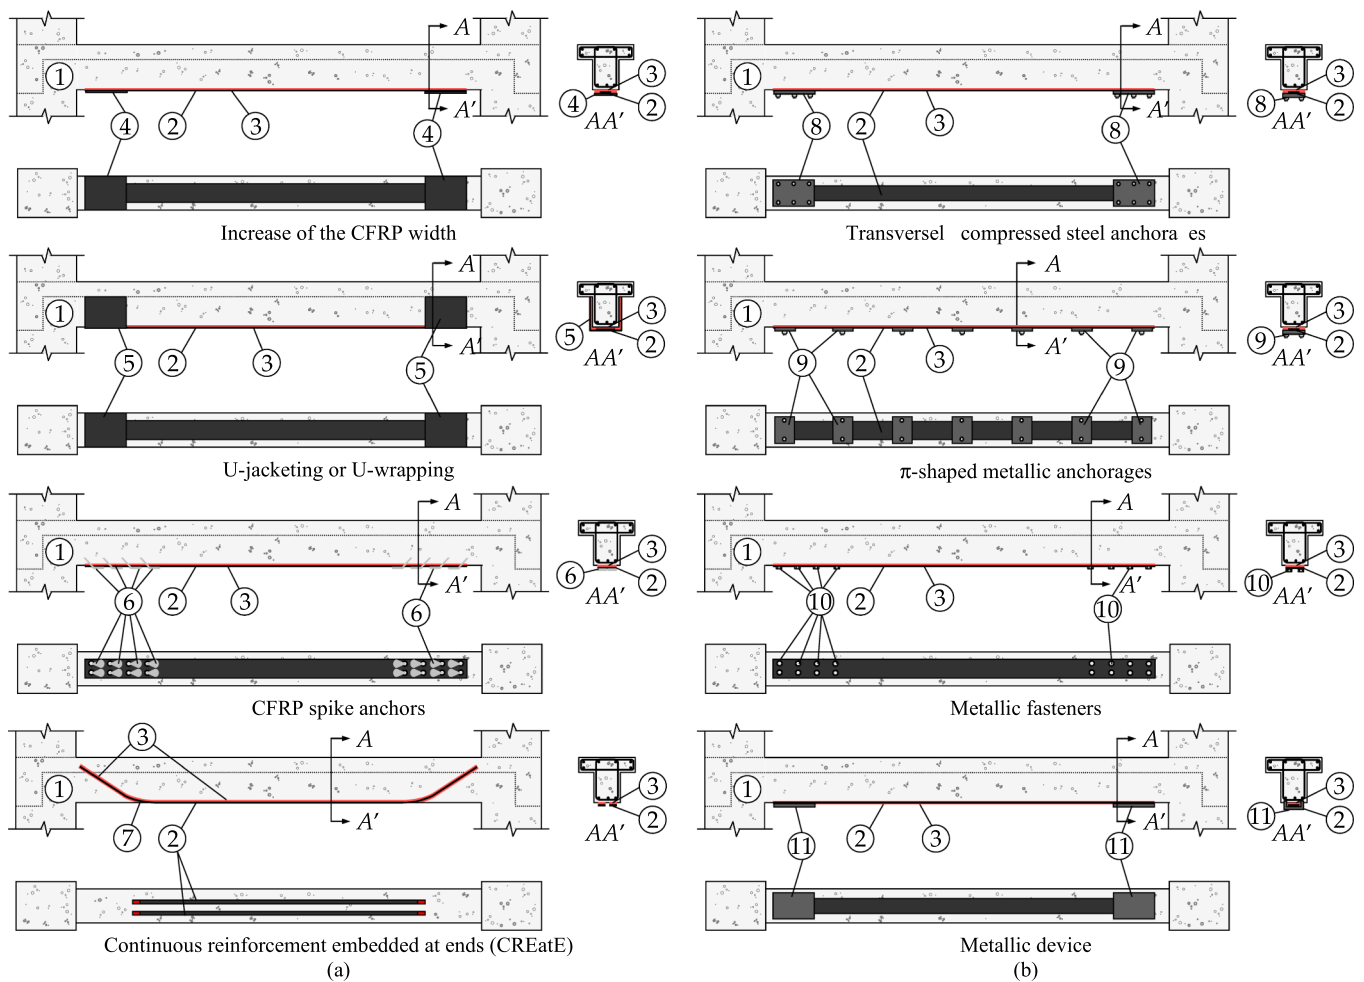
Examples of mechanical anchorages: (a) CFRP anchorage group; and (b) Metallic anchorage group. Key: 1 – Reinforced concrete beam; 2 – FRP composite; 3 – Adhesive; 4 – Wider CFRP anchorage; 5 – CFRP U-jacketing or U-wrapping; 6 – CFRP spike anchors; 7 – Transition curve; 8 – Transversely compressed steel anchorage; 9 – π -shaped metallic anchorages; 10 – Metallic fasteners; 11 – Metallic device.
